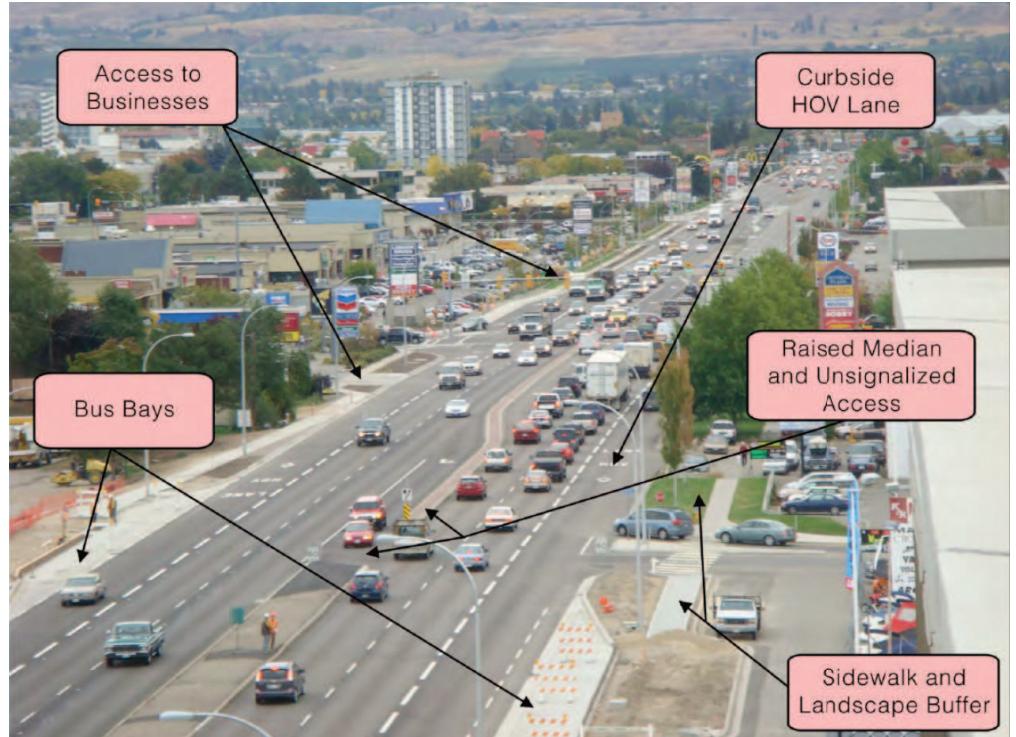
Source: State Street Transit and Traffic Operation Plan
